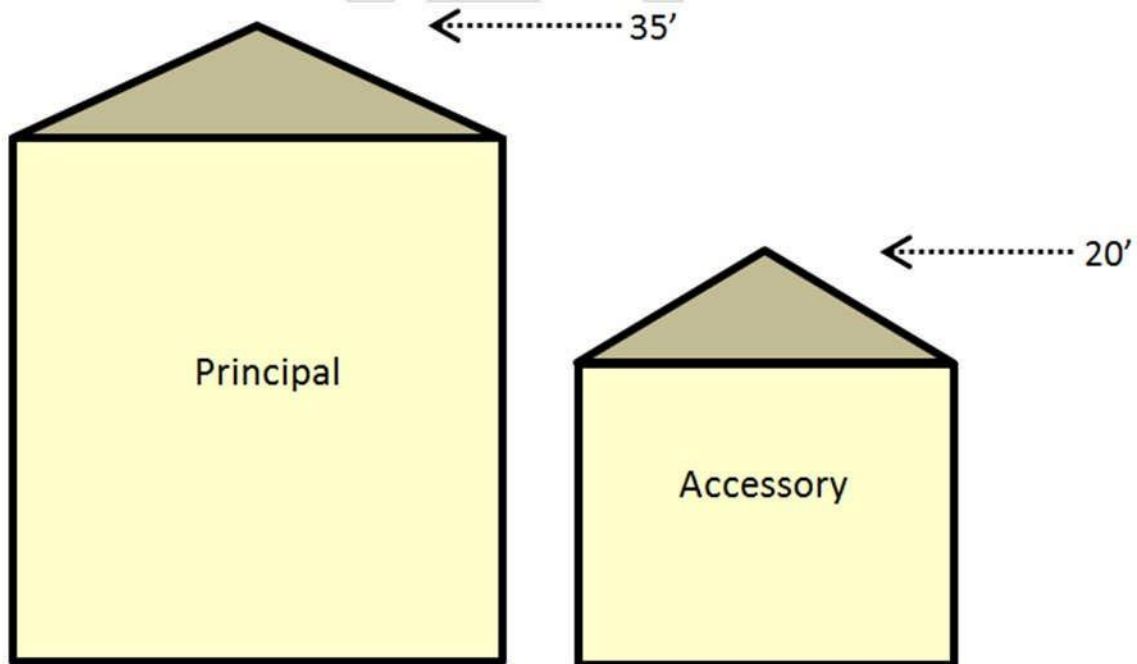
Typical RR-1 Zoning District Building Height Example (Abutting Lots Not Developed) (Not Drawn to Scale)
